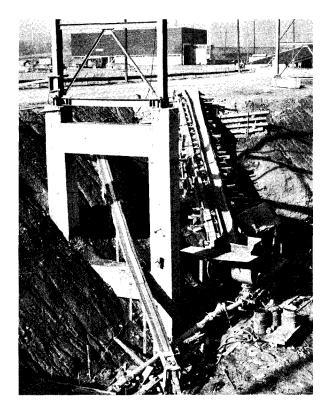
Pumpcrete plant showing materials chute, mixig hopper, and pump for transporting concrete directly to the forms through 8-inch lines.
